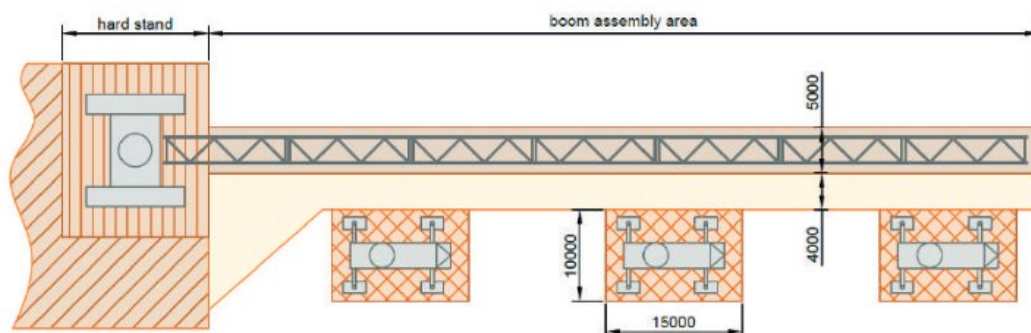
, Example for a hardstand and boom assembly area (49, p. 30)
